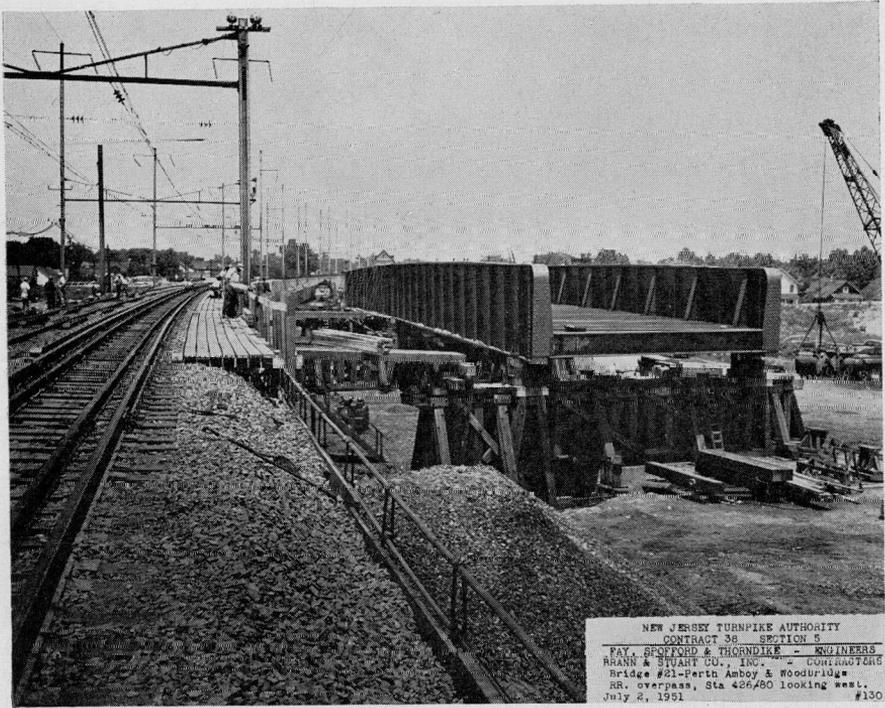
PERTH AMBOY & WOODBRIDGE RAILROAD BRIDGE.
